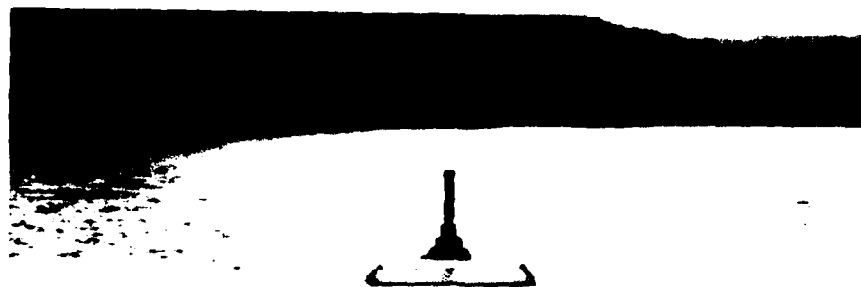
Zoom - lens view of low-level outlet gate valve stem (8/21/80).
